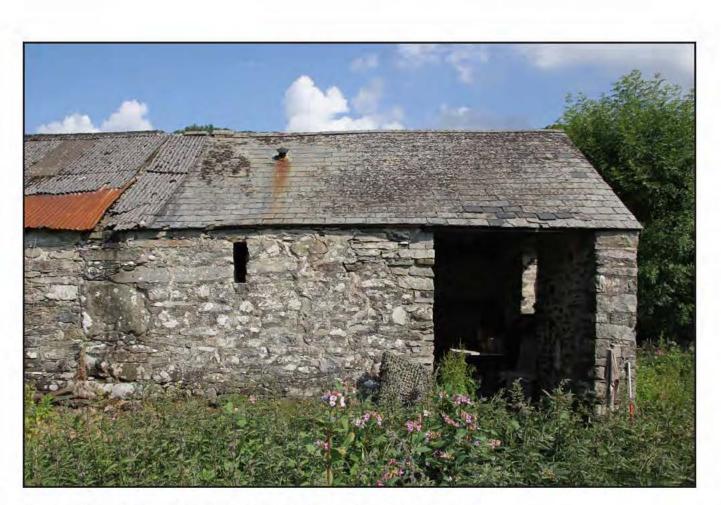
Southeast facing external elevation (northeast end), from the southeast. Scale 1.0m.
